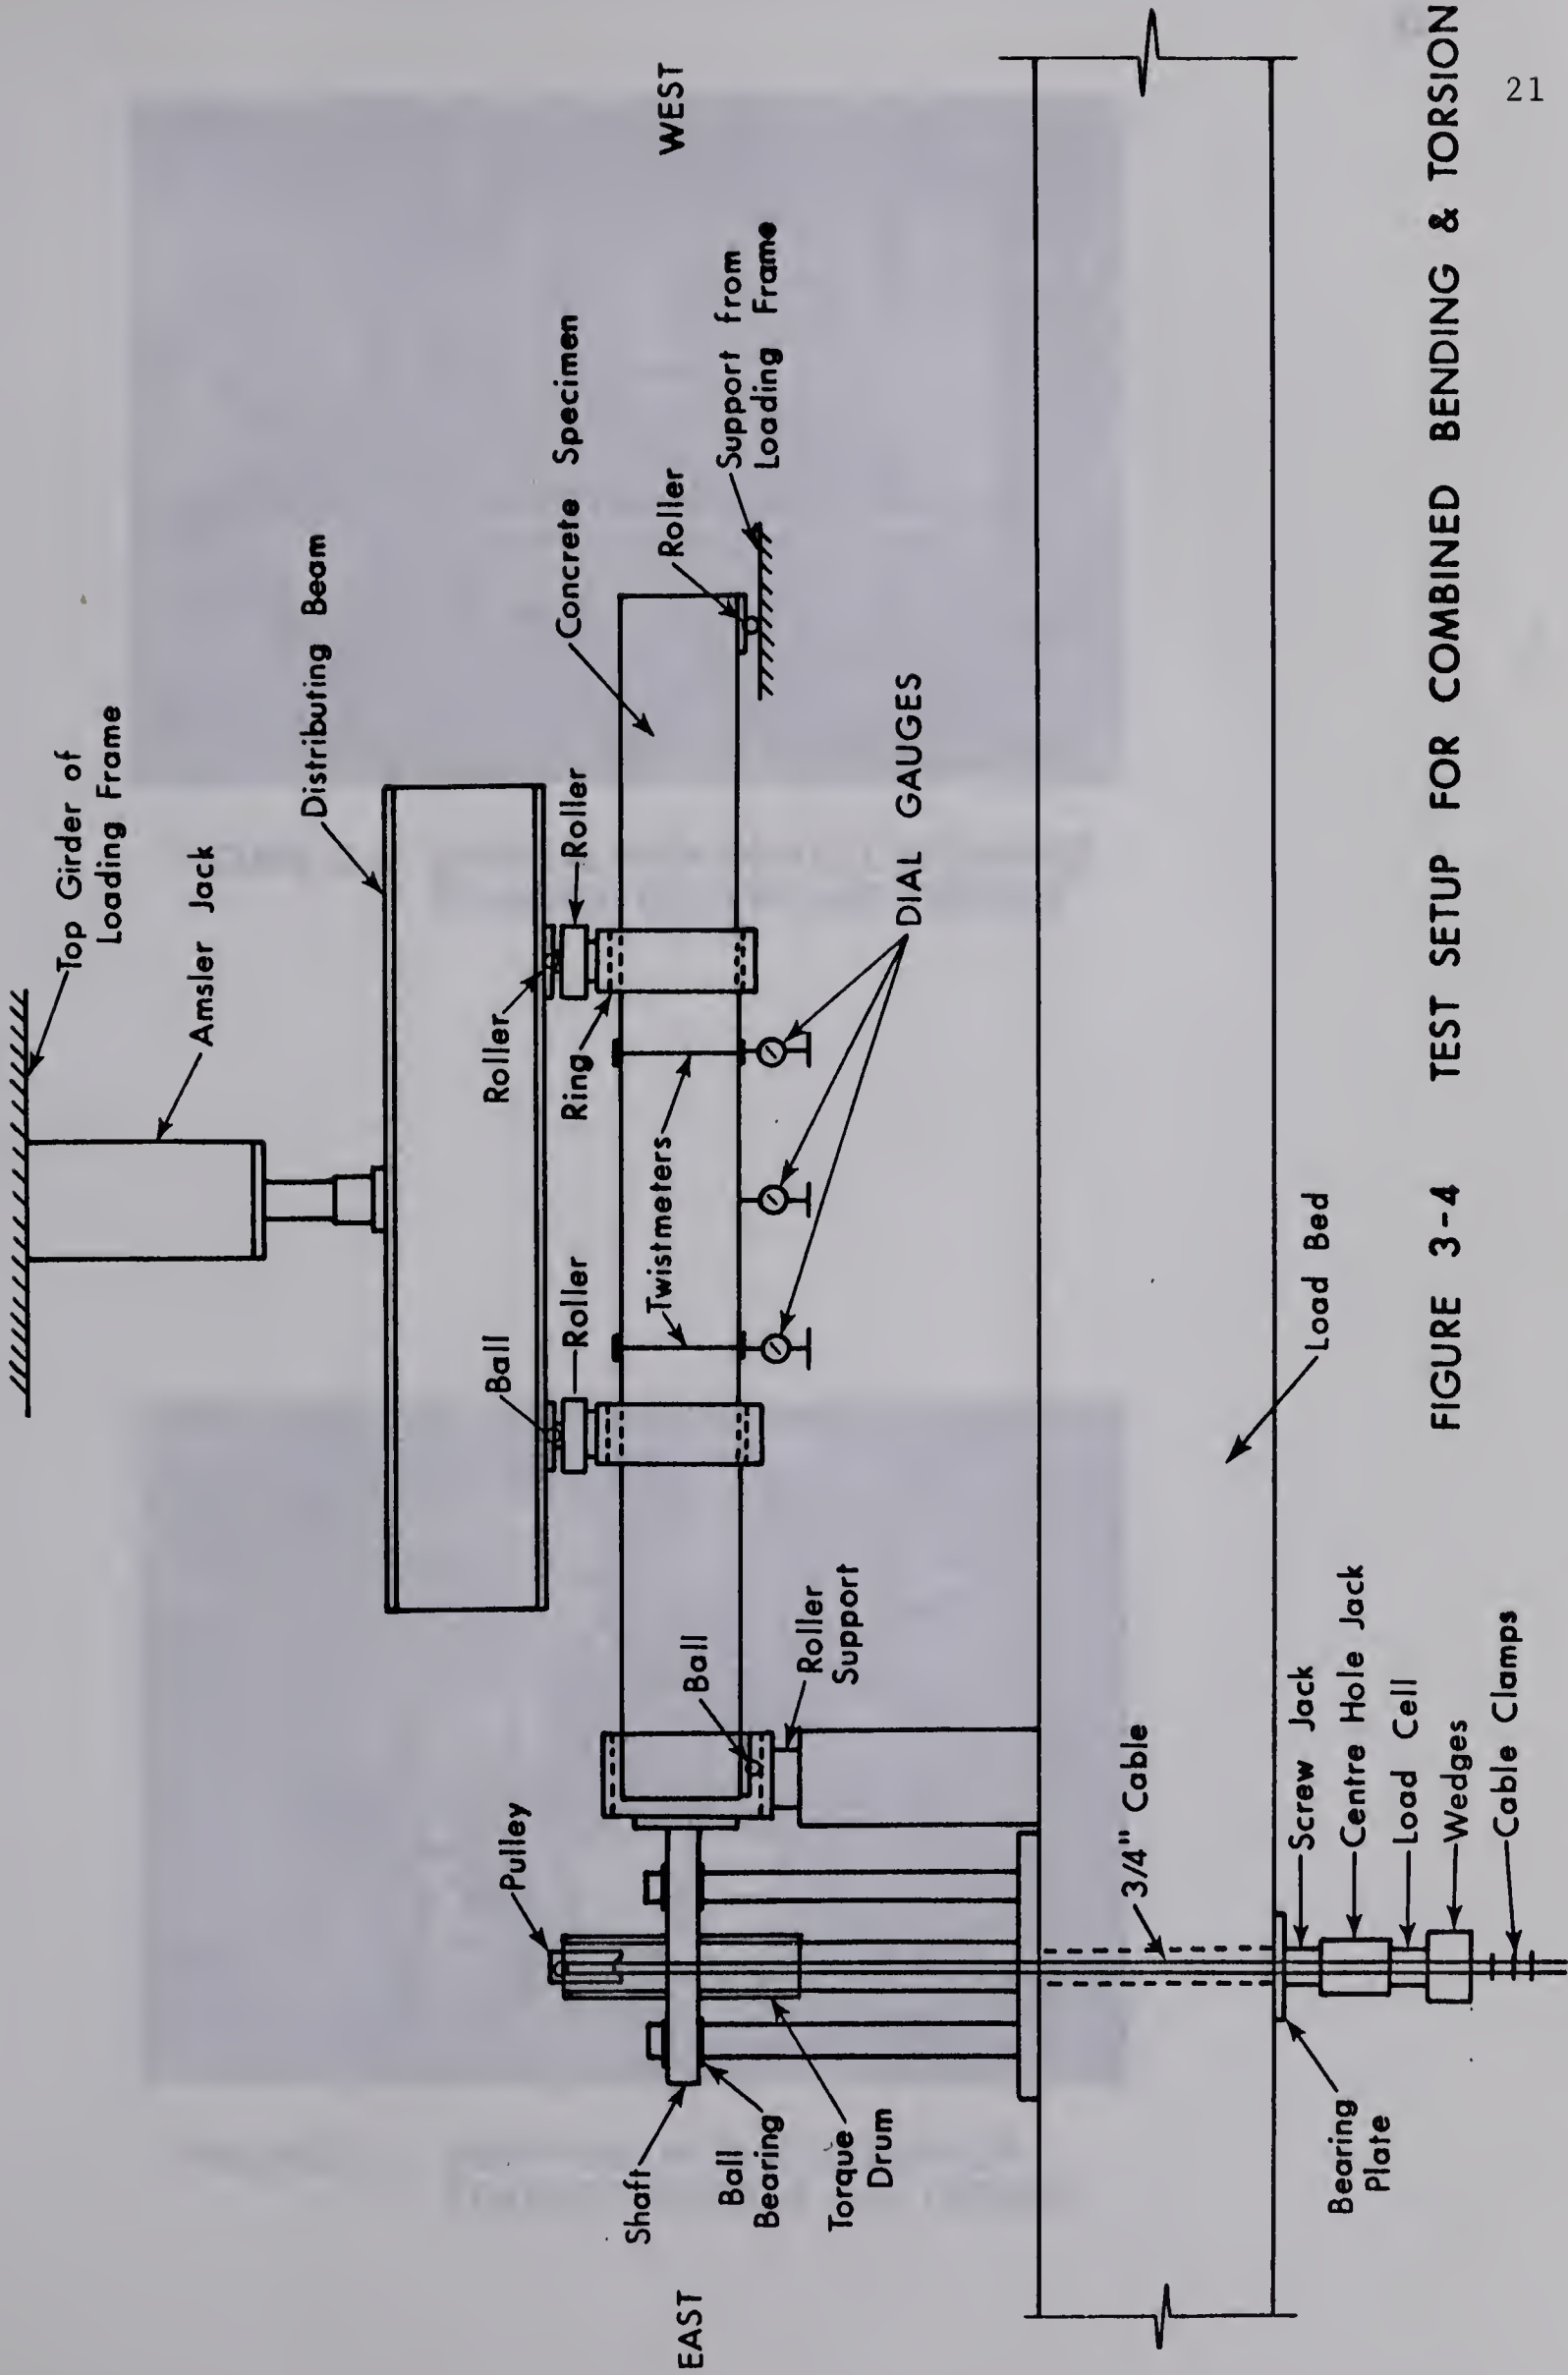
TEST SETUP FOR COMBINED BENDING & TORSION
